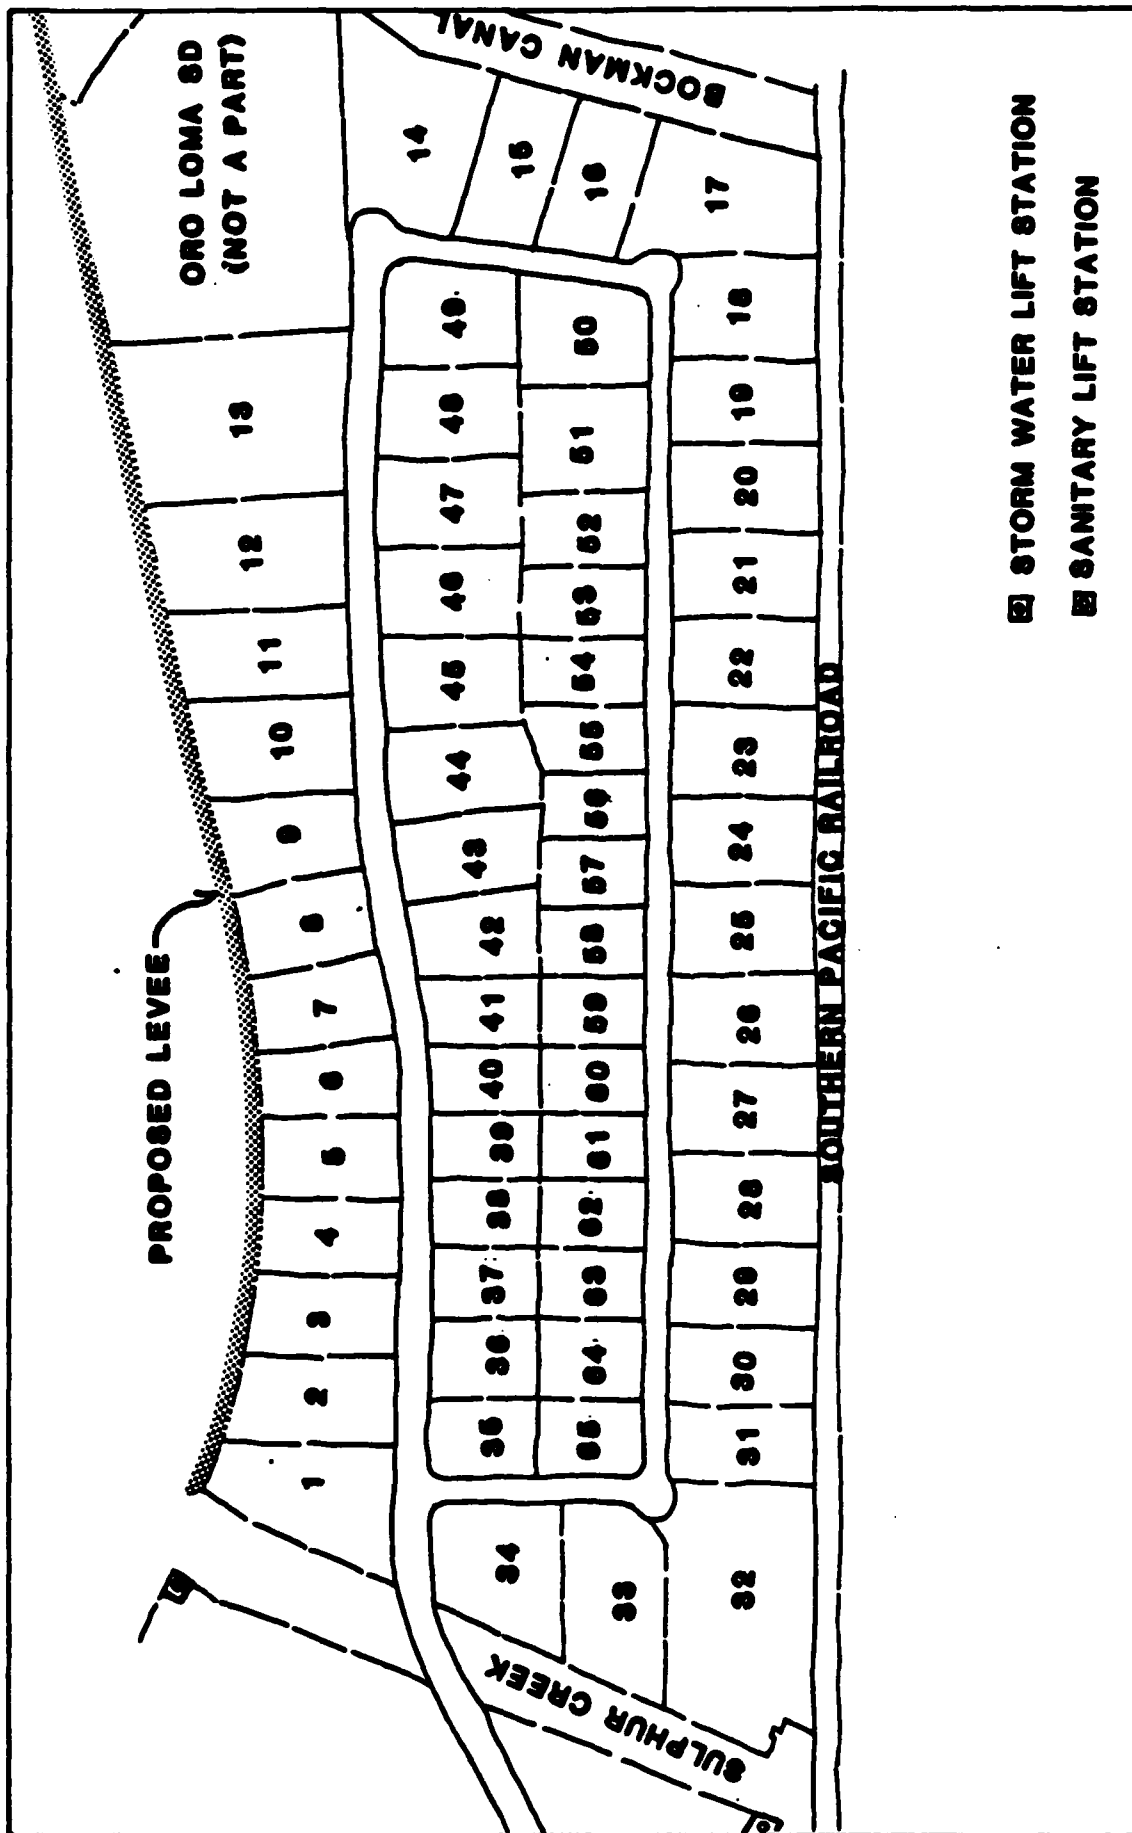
PROJECT SITE PLAN AS PROPOSED BY APPLICANT (ALTERNATIVE 1)
